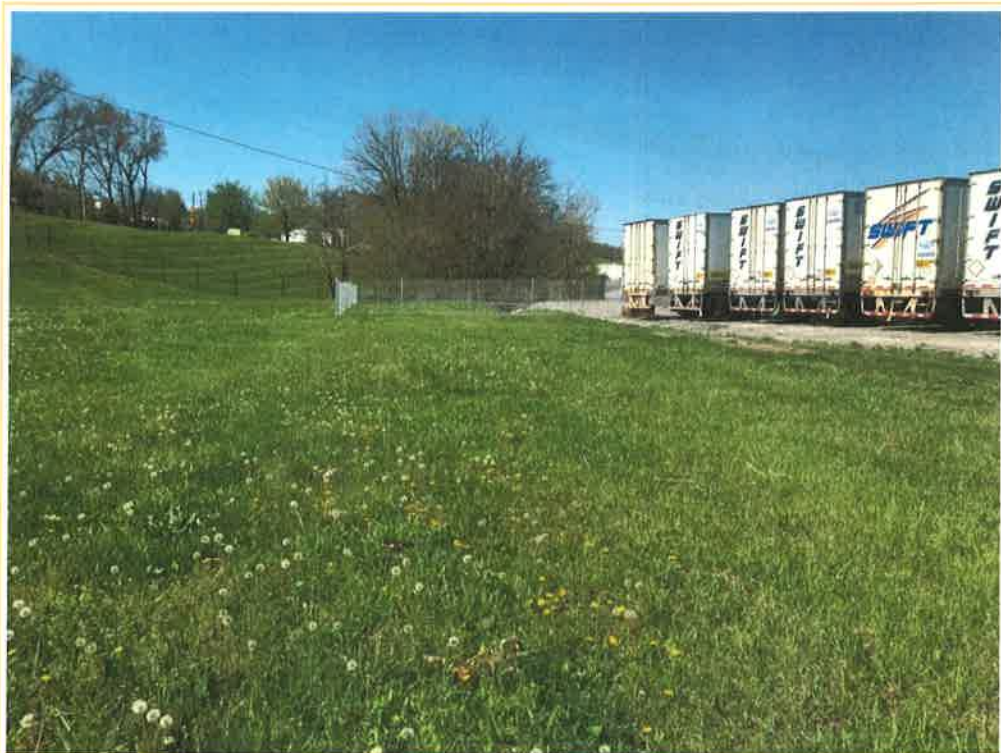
Existing 2 x 60” CMPs are underground at this location and are proposed for replacement. Fencing around collapsed area is visible in this photo.
